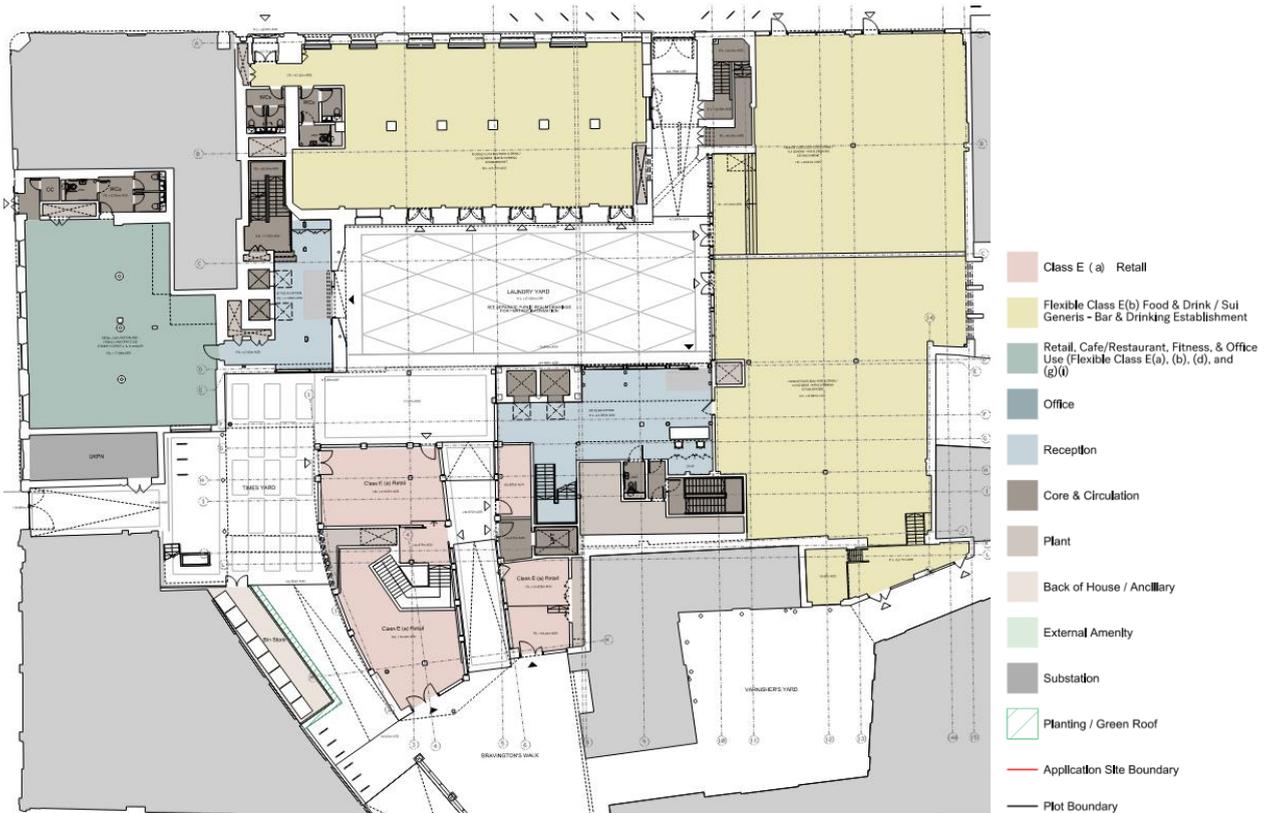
Proposed Ground Floor Layout and Uses – Times House and Laundry
